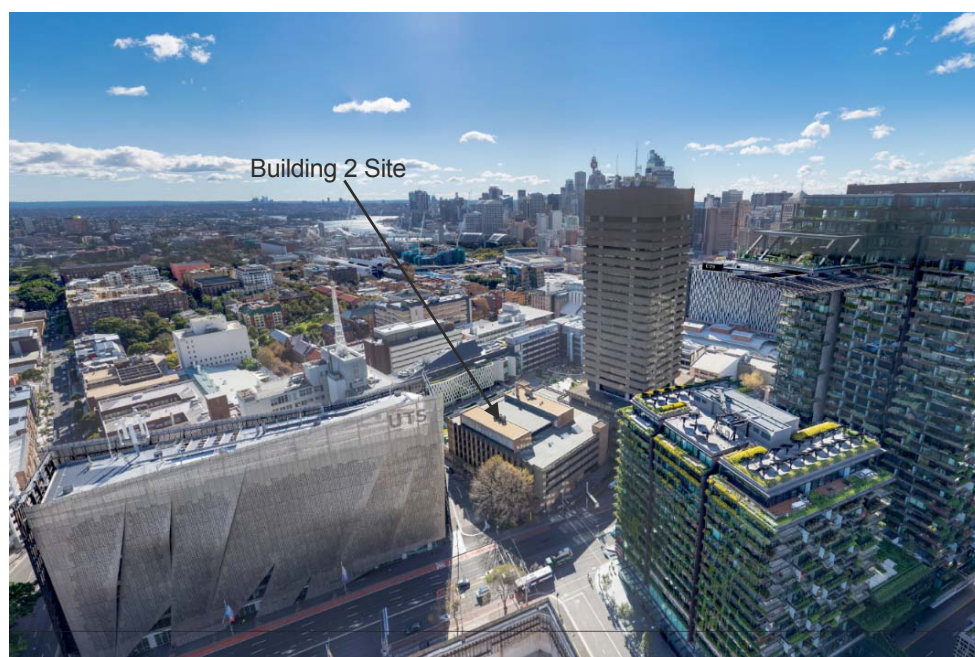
Aerial view of UTS Broadway Precinct and surrounds
